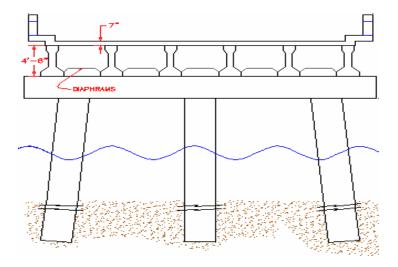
2-D structural dimensions of I-10 Bridge over Escambia Bay
